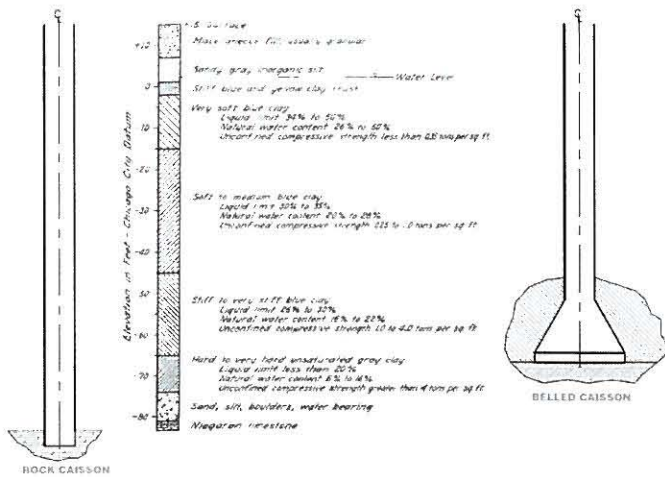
Where caisson types are used in the typical Chicago soil profile.
